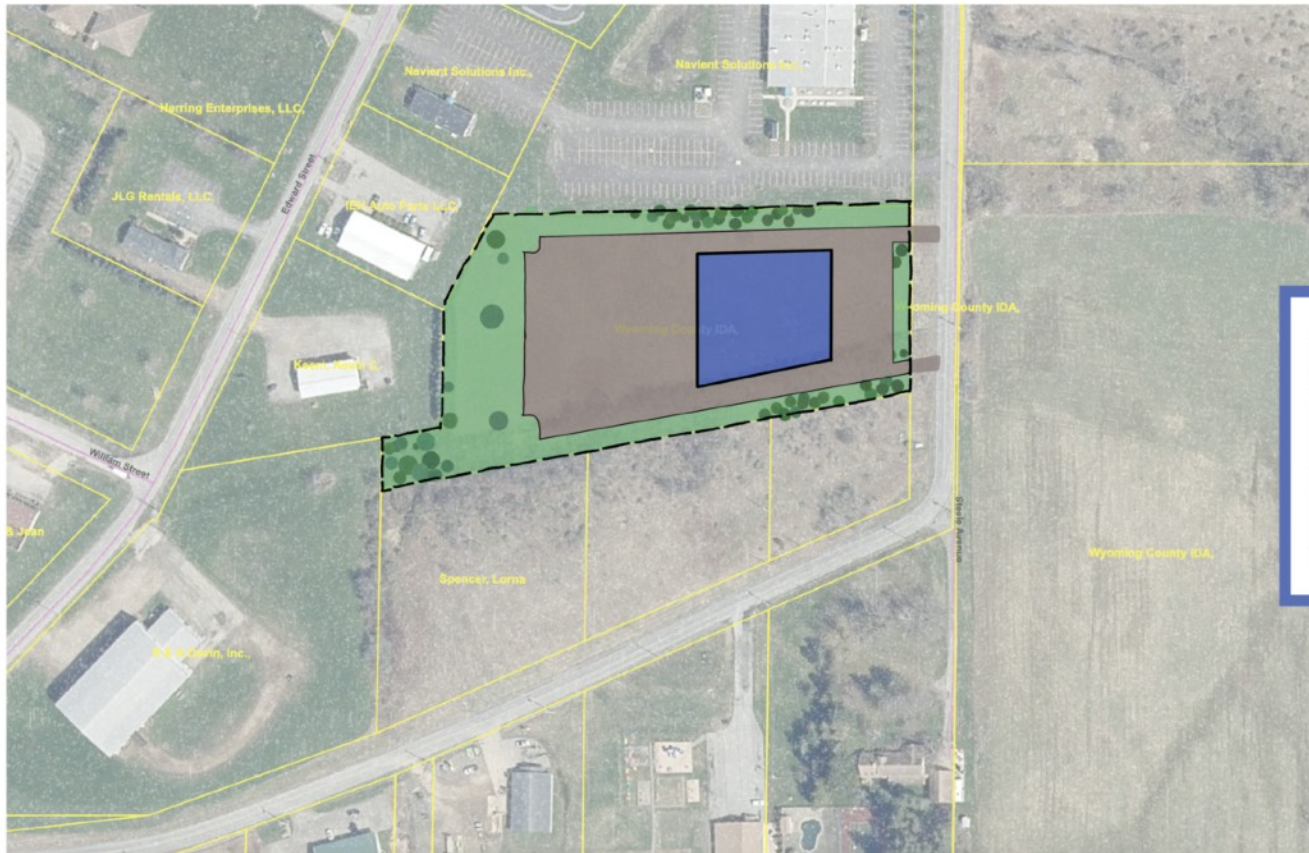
B: STEELE AVE SMALL ALTERNATIVE SITE PLAN - Apartments only
